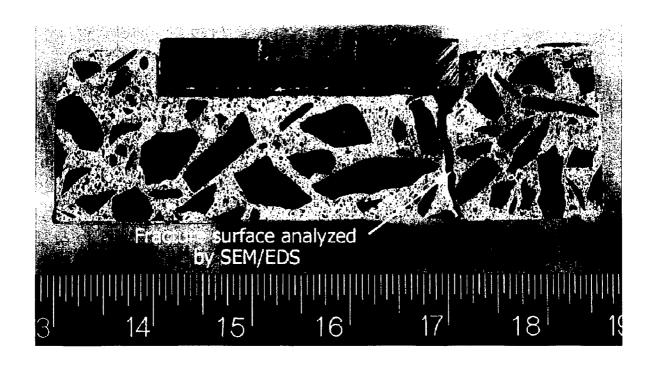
Cross-section view of Core 122, Section 1 (lapped surface).
